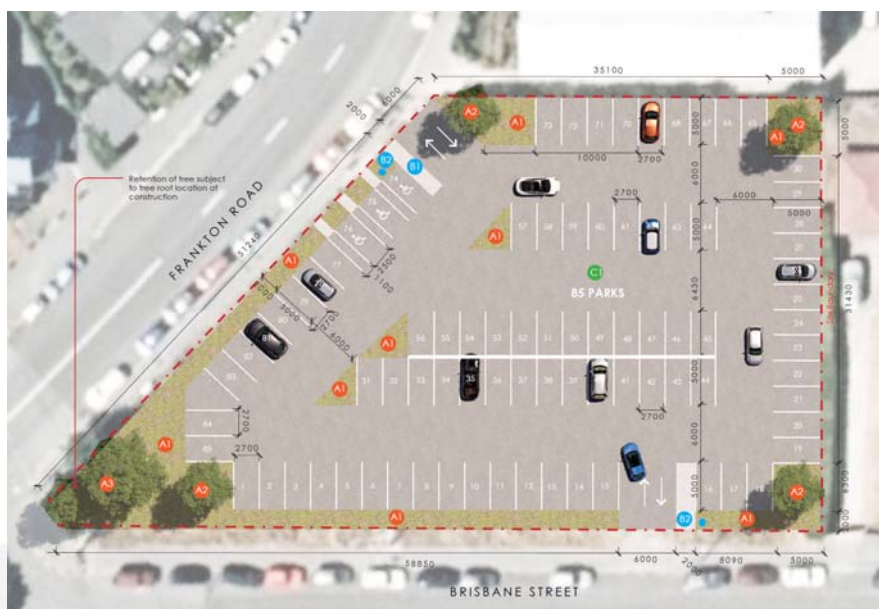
Proposed Site Layout (Extract from DCM Urban Drawing)
